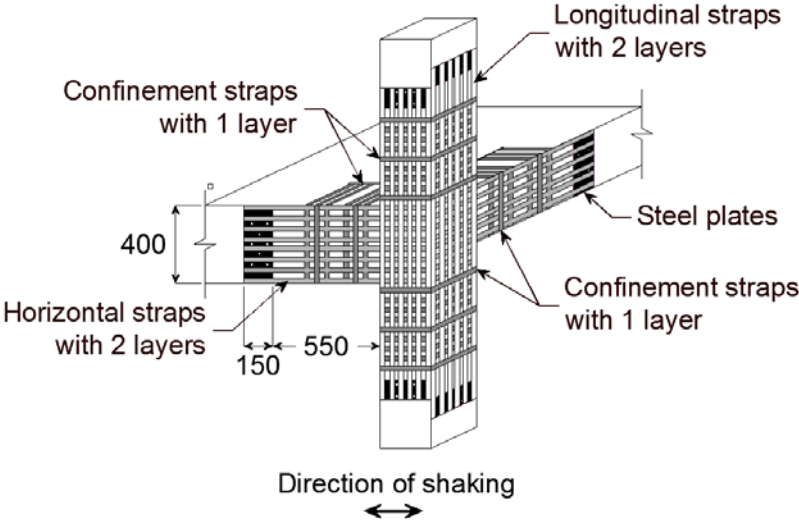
PTMS strengthening intervention at 1st floor beam-column joints
